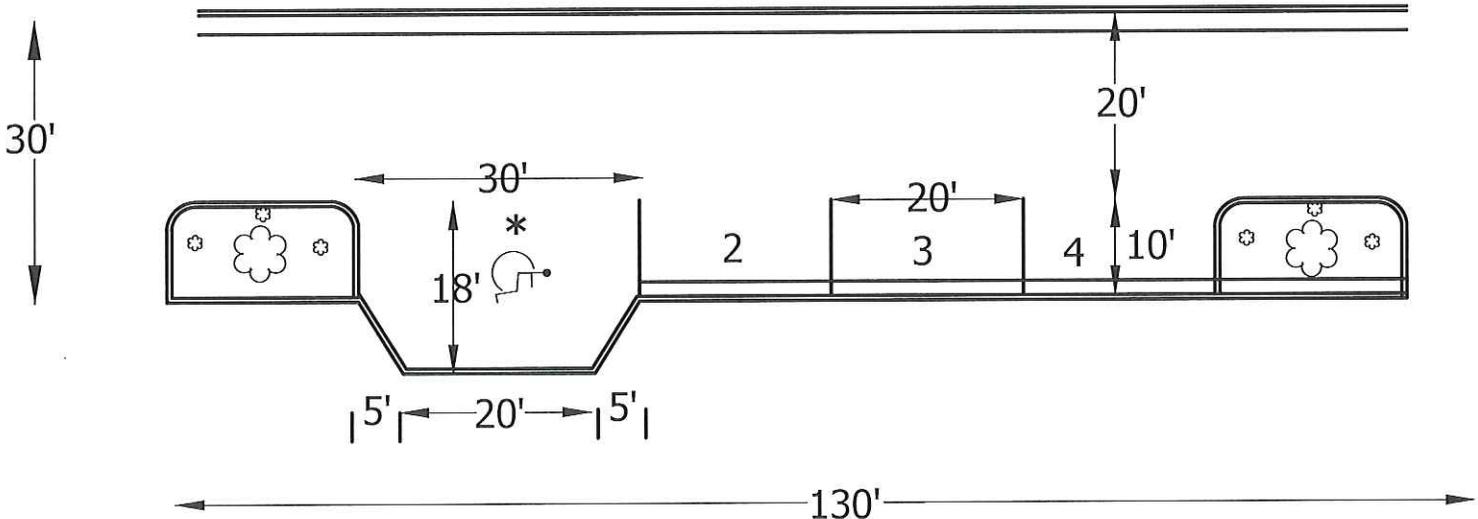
A parking lot of equivalent size to Figure 7, with two (2) landscaping islands as required by the Parking Lot Landscaping Requirements Section 10-3-30.1(5) and four (4) parallel parking spaces.
